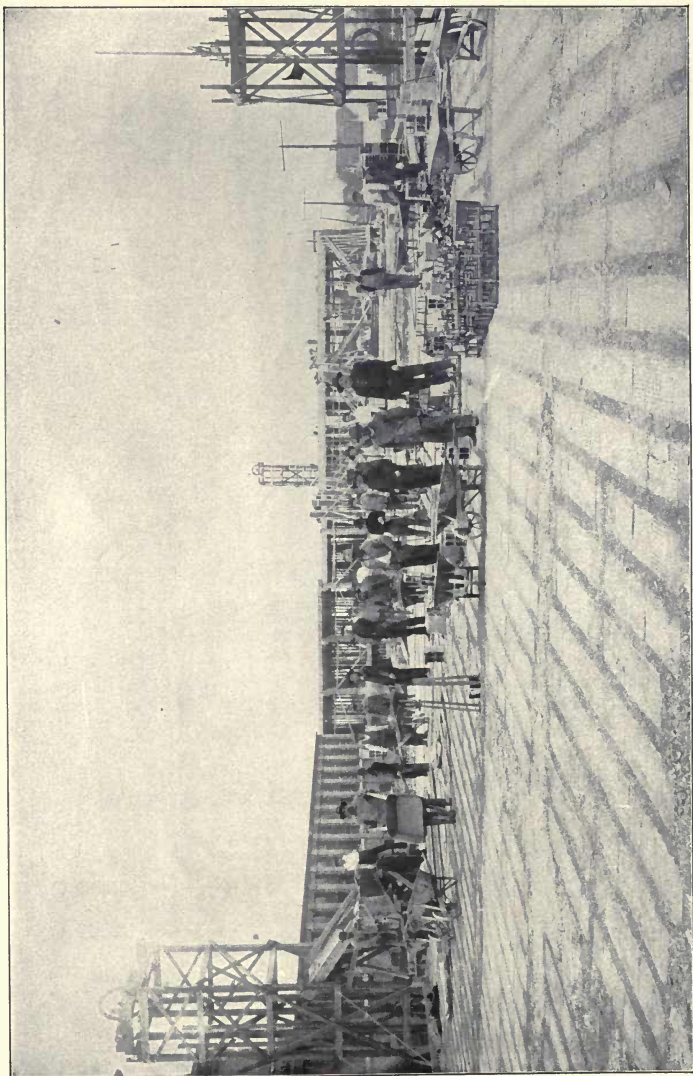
Concrete and Tile Floor under construction. (See p. 138.)
